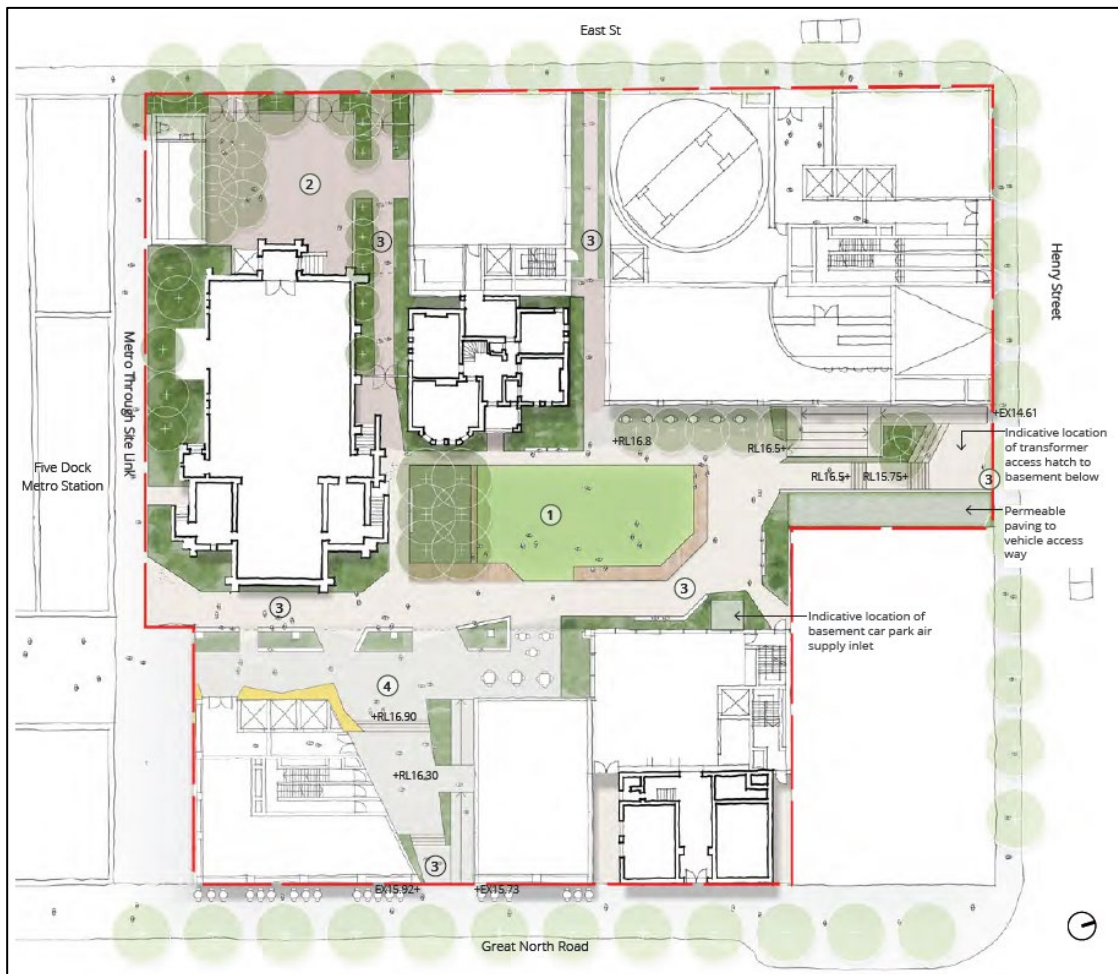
LANDSCAPE CONCEPT PLAN
